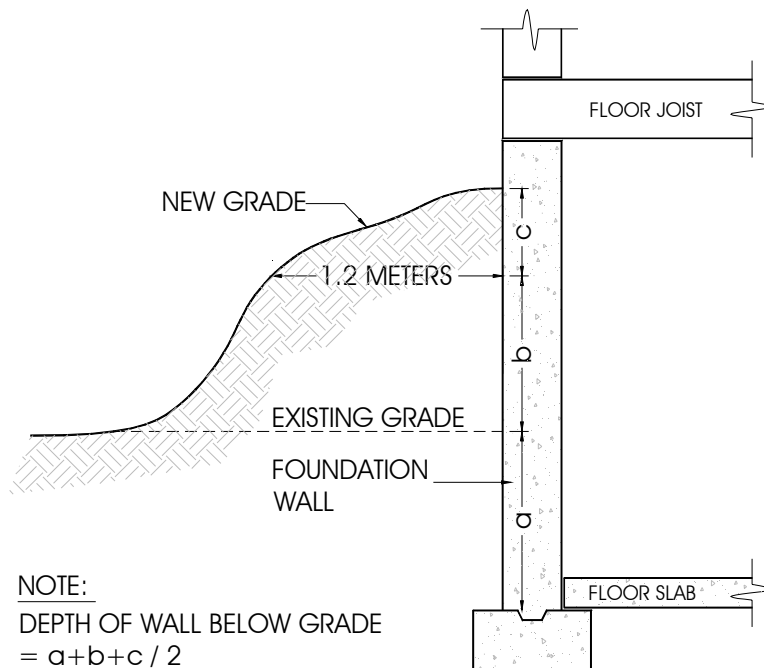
Depth of Below-Grade Wall When Earth Berms Are Used
